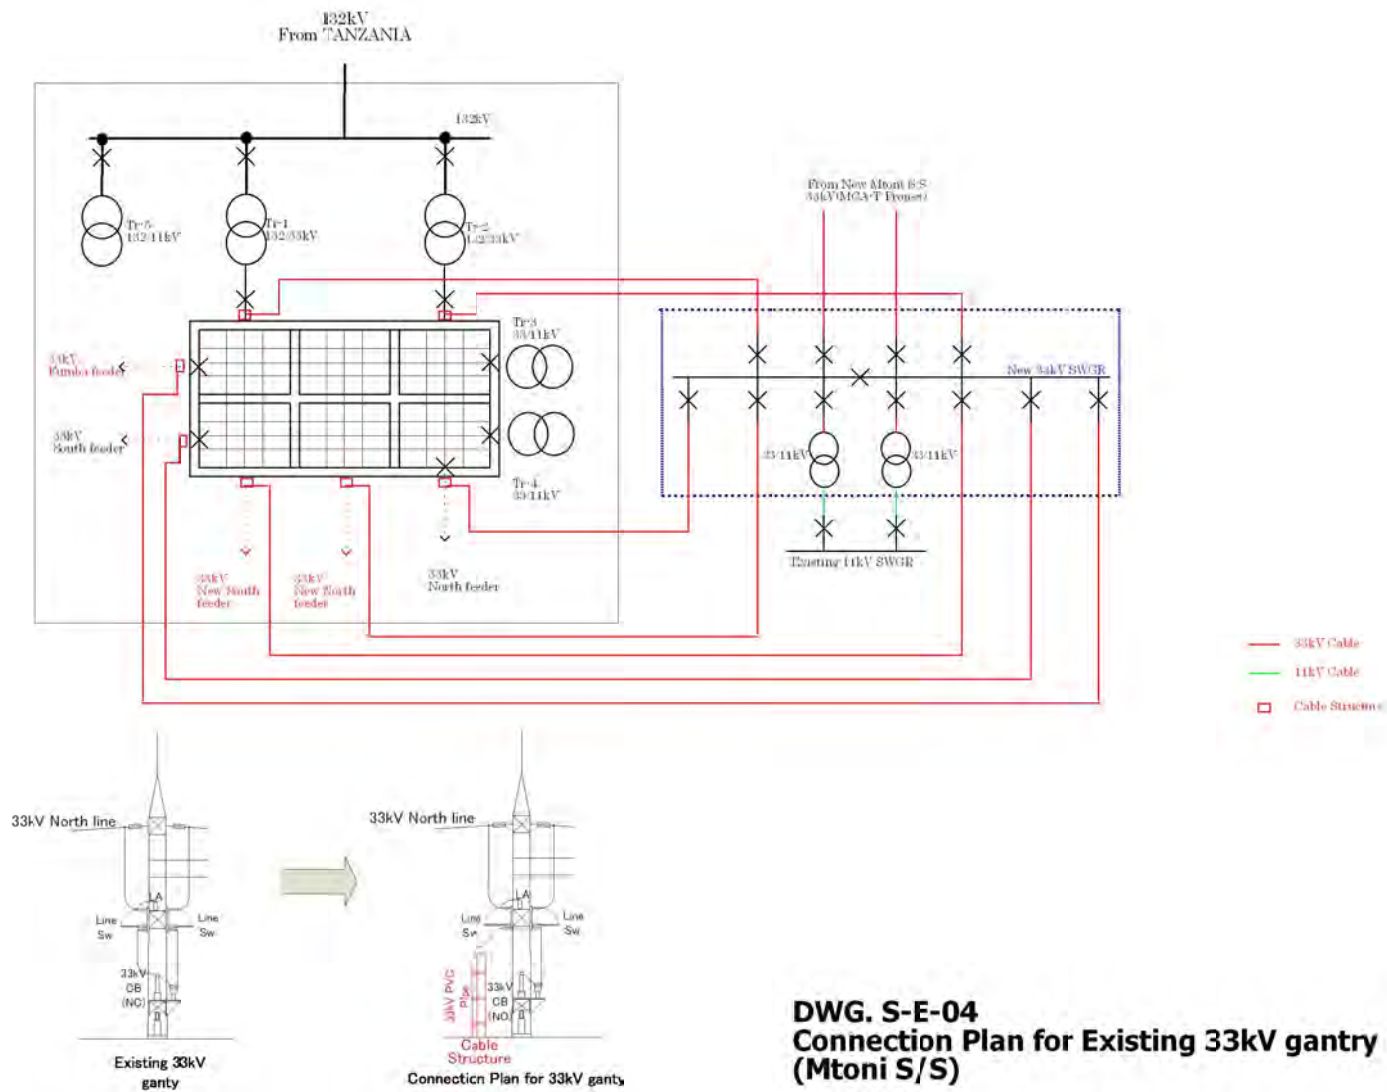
Connection Plan for Existing 33 kV Gantry
